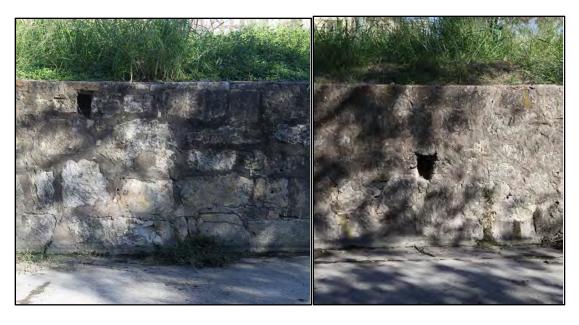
Seam at meeting of stone wall and base of bridge at Salinas Street (a) and Travis Street (b).
